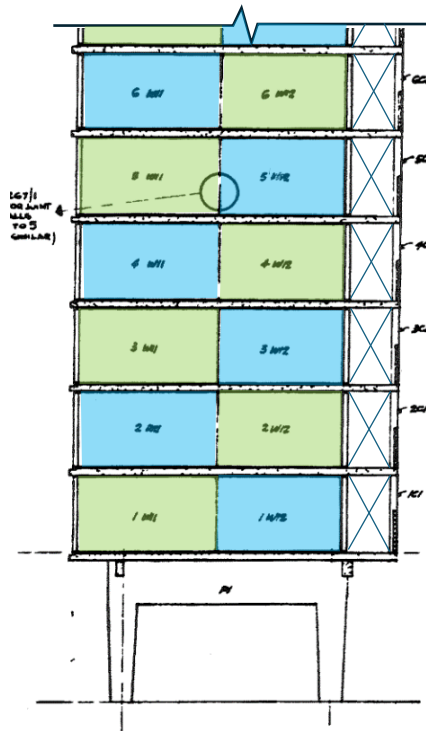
Typical elevation of apartment party wall (section taken in the west wing of the building looking towards the east). Note this is a partial elevation which terminates at level 7, detailing indicated here continues to roof level)
